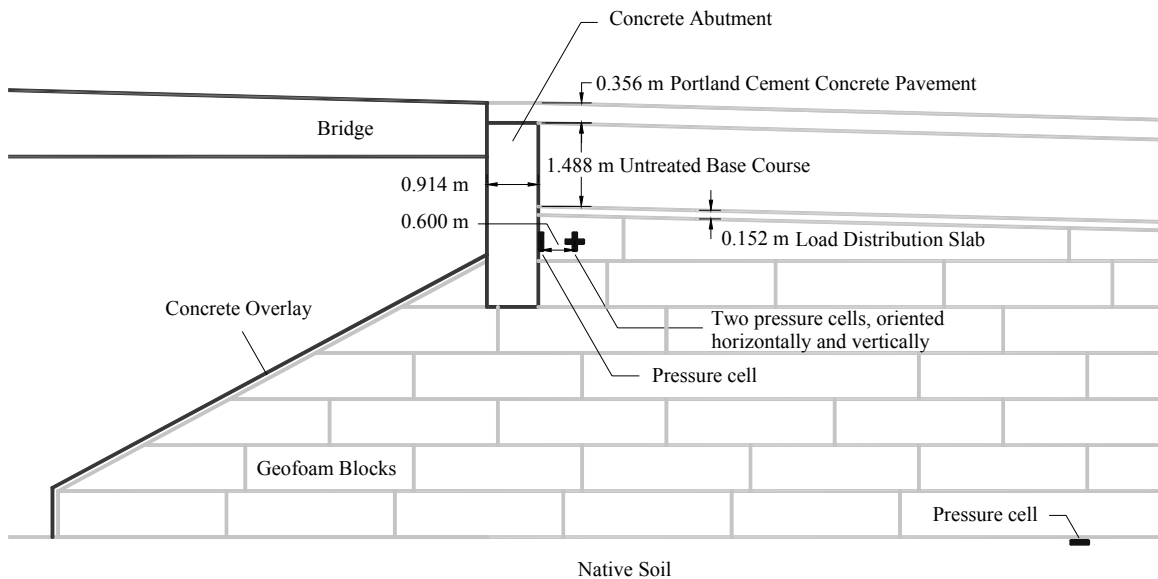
Geofoam cross-section (parallel to bridge) at the west end of the State Street off ramp.
